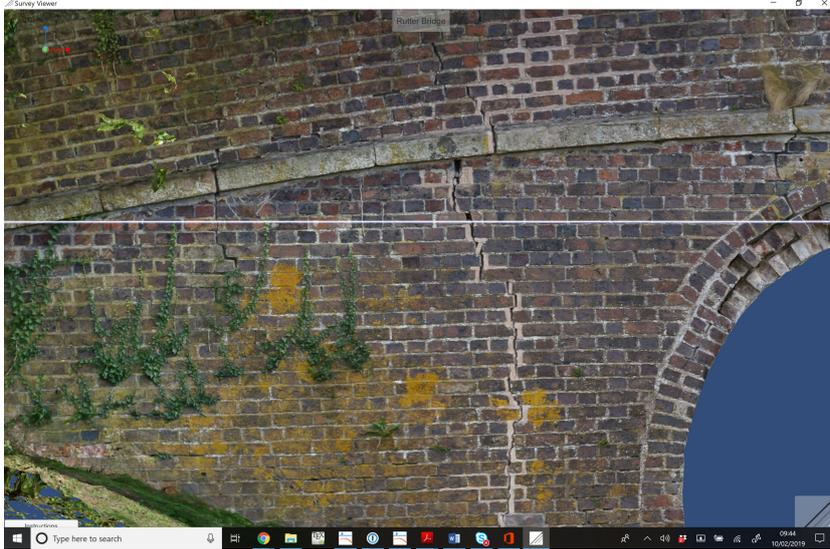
Closer view of left abutment face shows multiple vertical cracks with courses tilting backwards.
